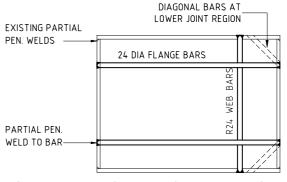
Restraint Bars Fitted to Extension Trestle Columns
